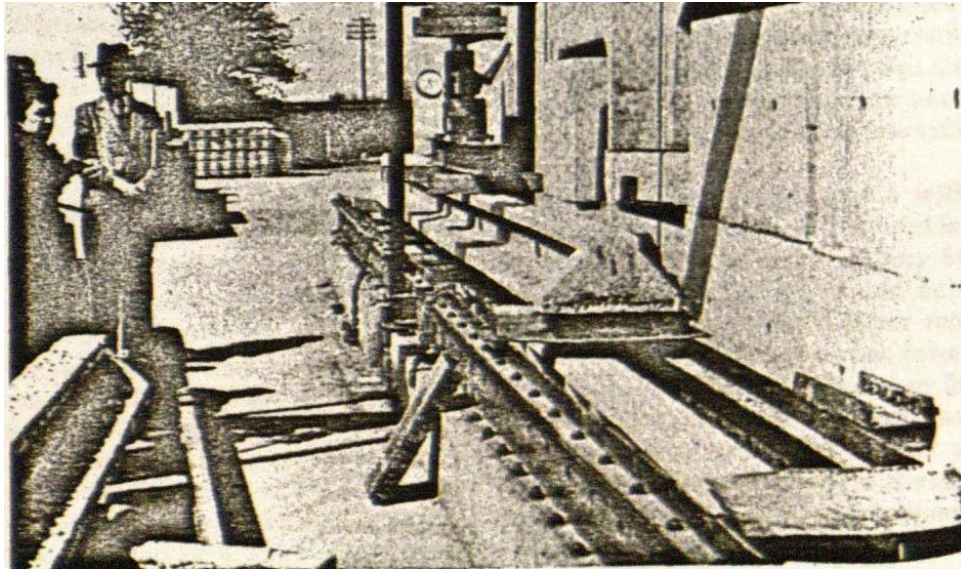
Fatigue test of partially prestressed concrete inverted T Beam at precast prestressed concrete plant (Bennett 1984)
